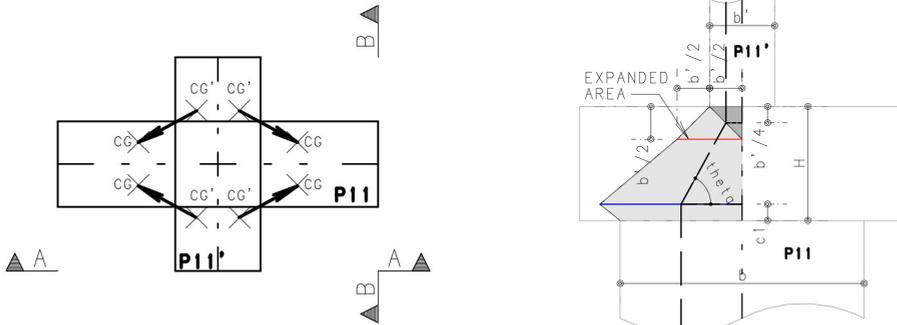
Direction of the Load Path in Model 1 | Section AA: Model 1
